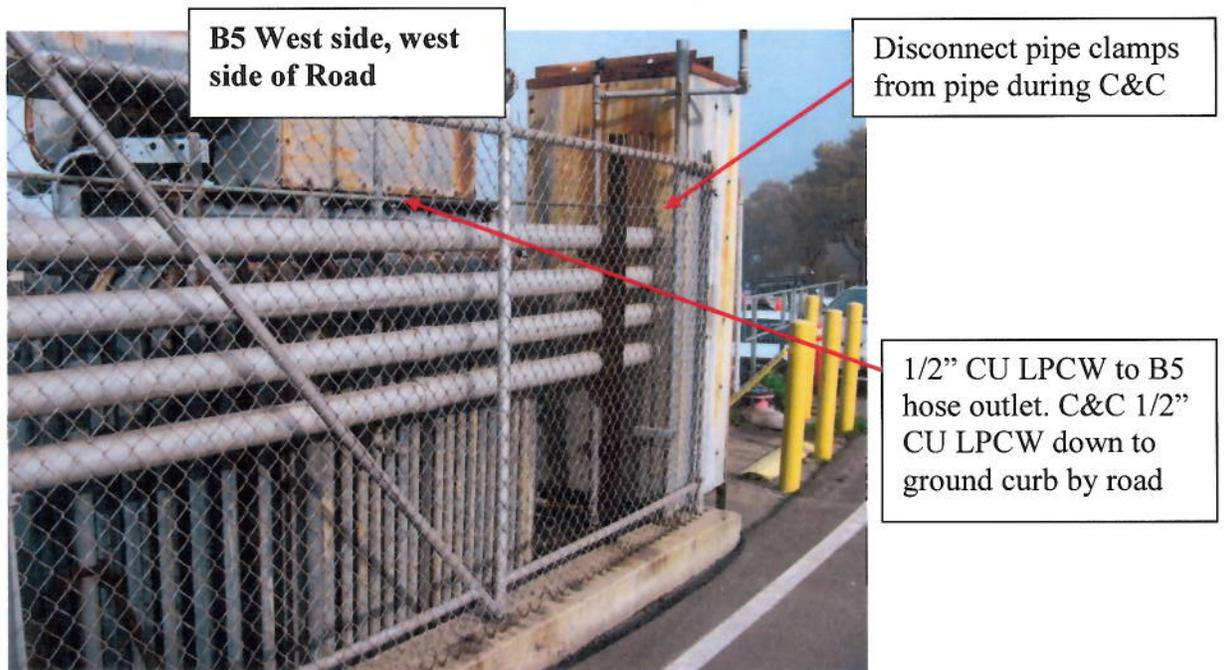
1/2" LPCW supply to B5 GW filters hose outlet
